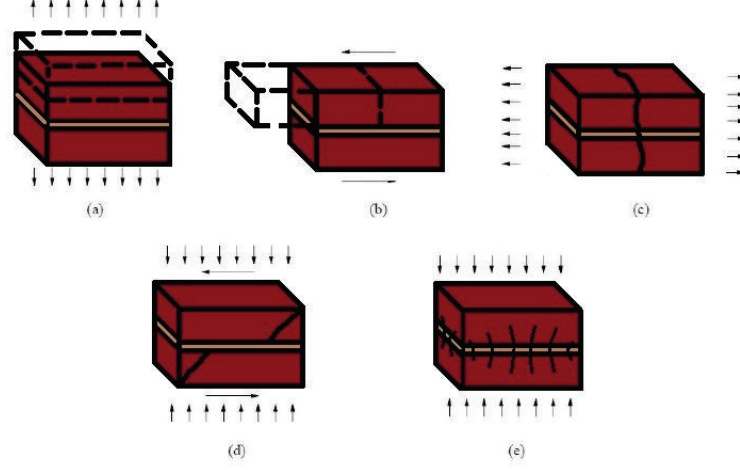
Masonry failure mechanisms: (a) joint tensile cracking (b) joint slipping (c) unit direct tensile cracking (d) unit diagonal tensile cracking (e) masonry crushing
